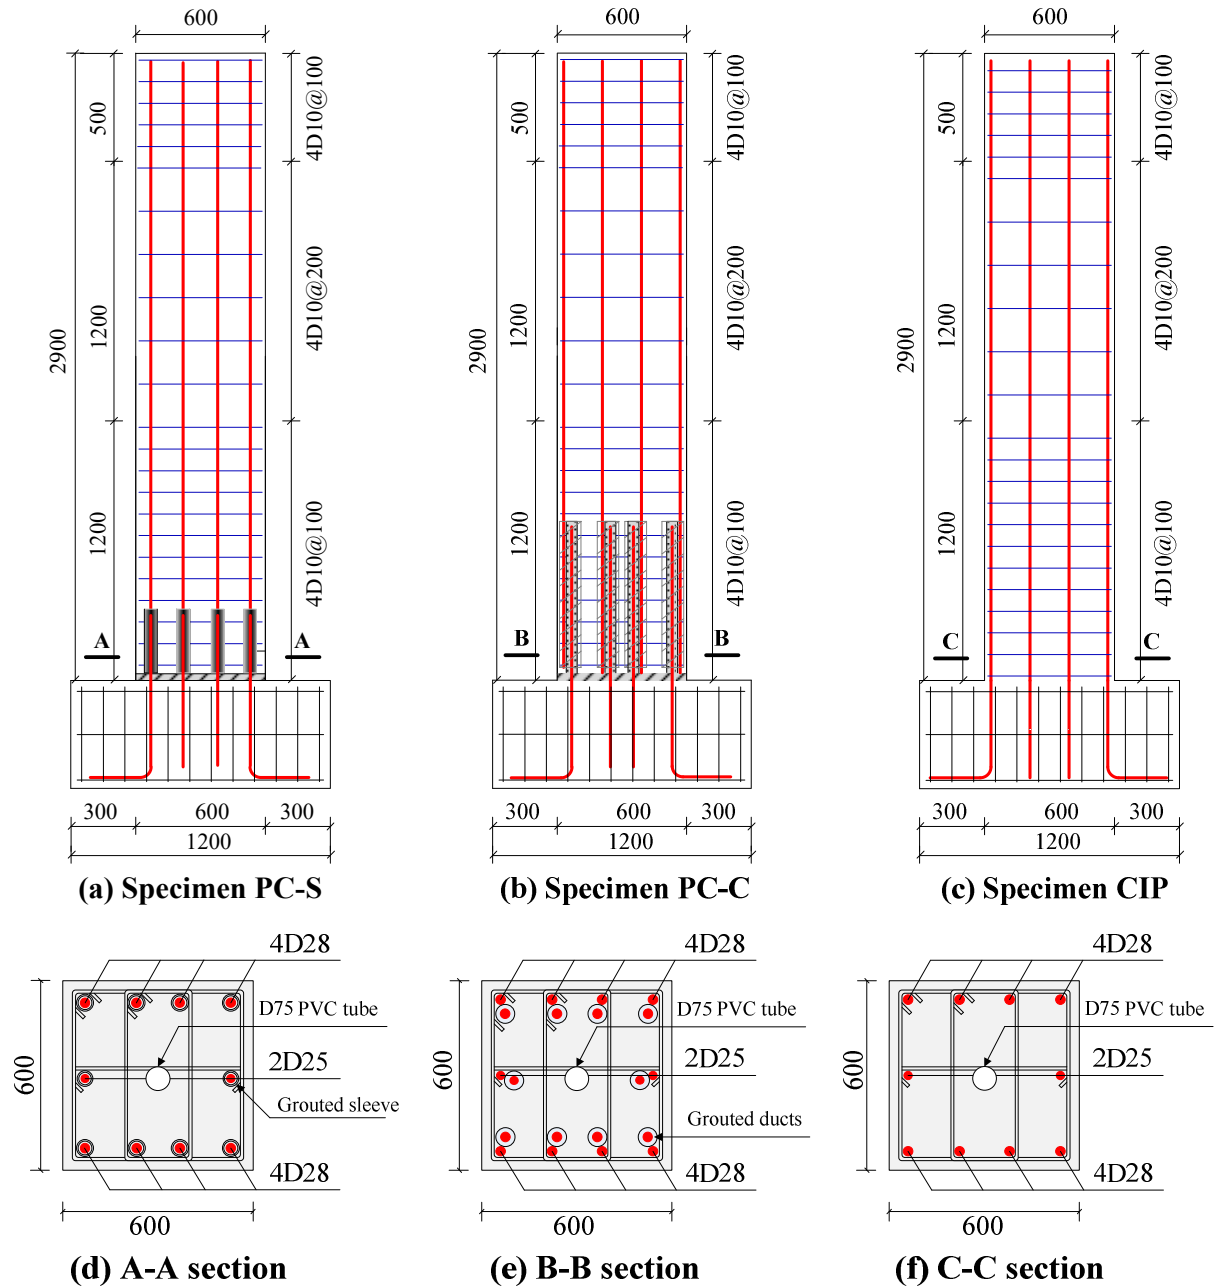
Configurations and reinforcement details of test specimens (Dimension in mm)
